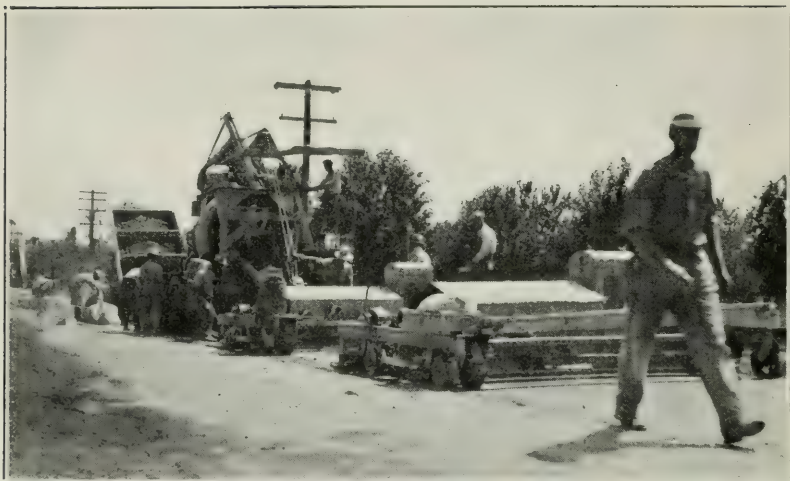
PLATE XXXII. Constructing concrete pavement between Healdsburg and Santa Rosa in Sonoma County.
